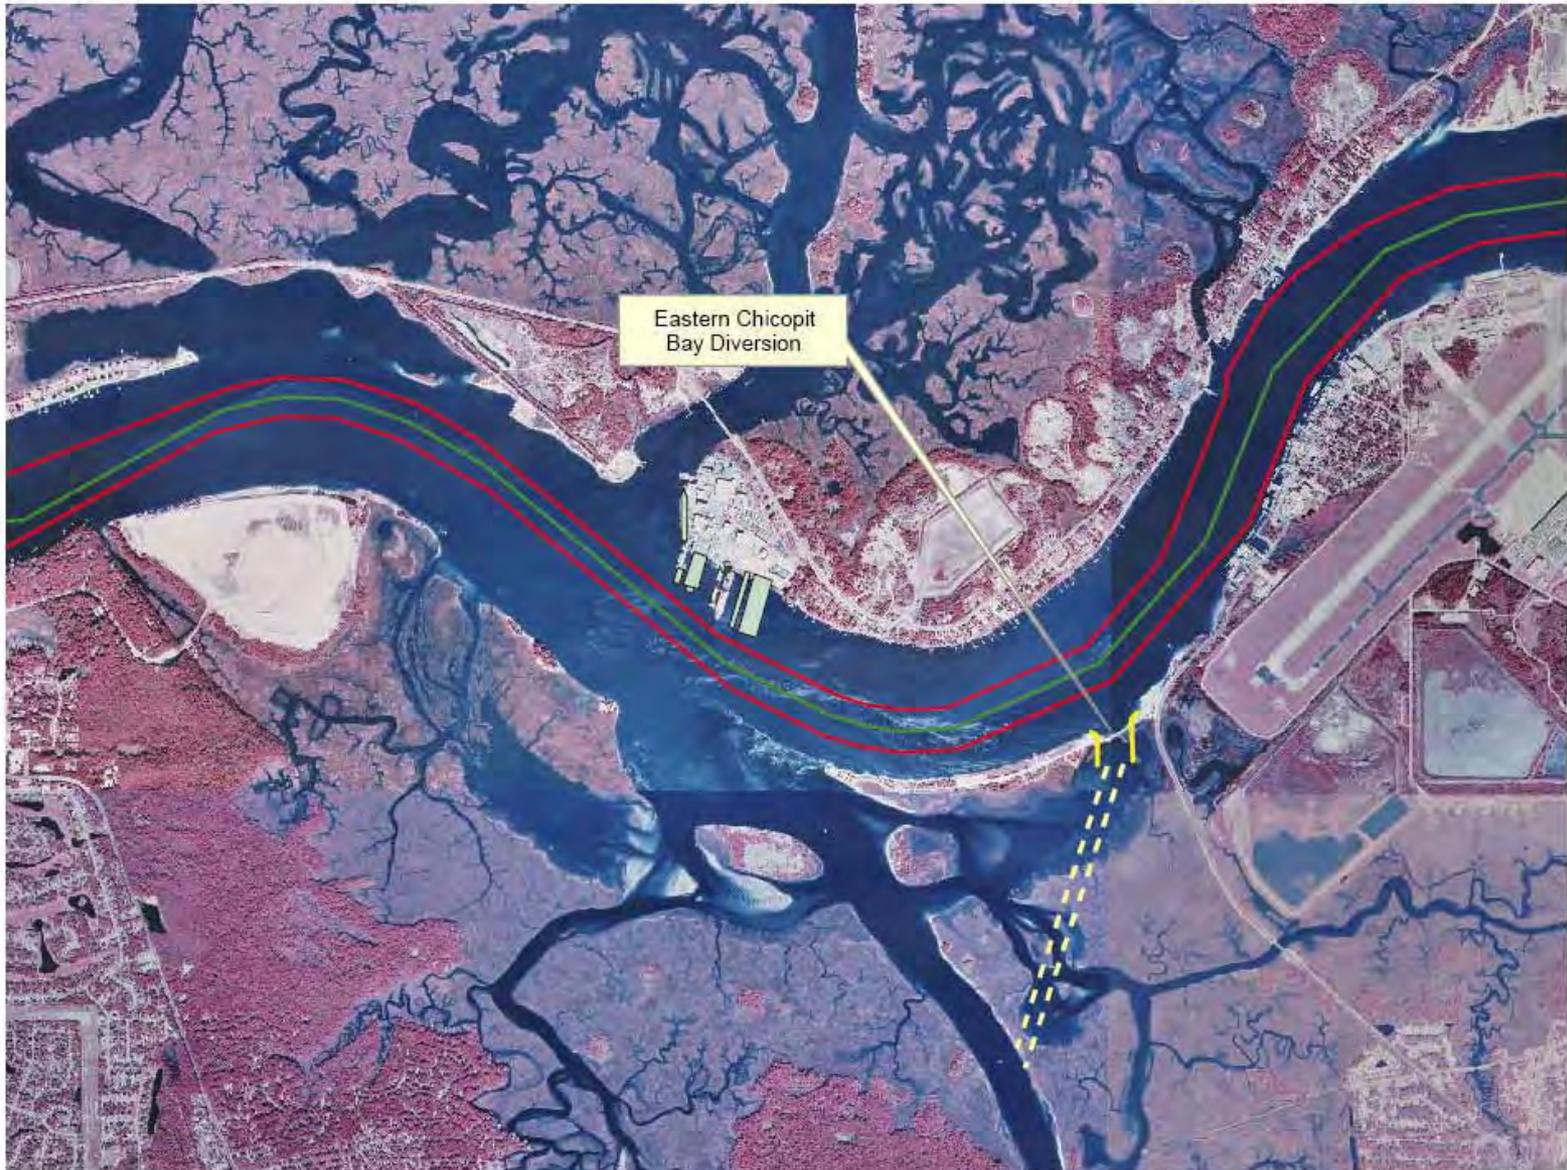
Proposed Alternative: Eastern Chicopit Bay Diversion
